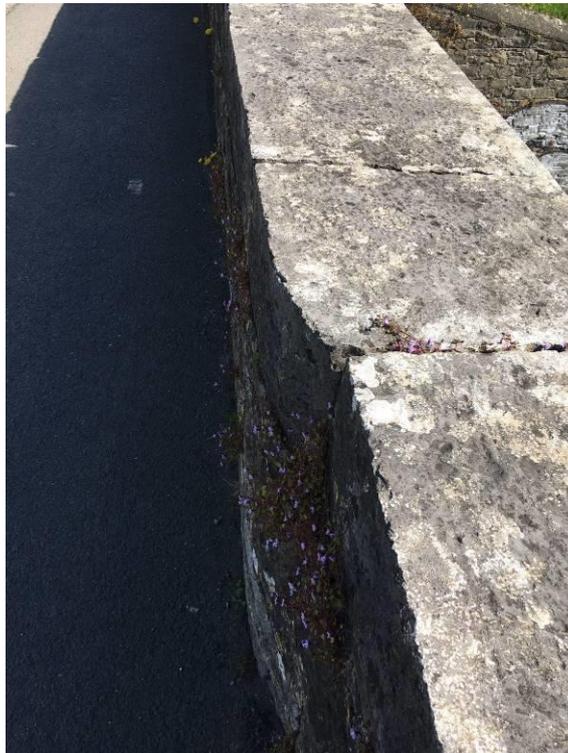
View taken looking down on coping stones on Cope Bridge's north east parapet, showing the depth of the wall top extending into the bridge.
